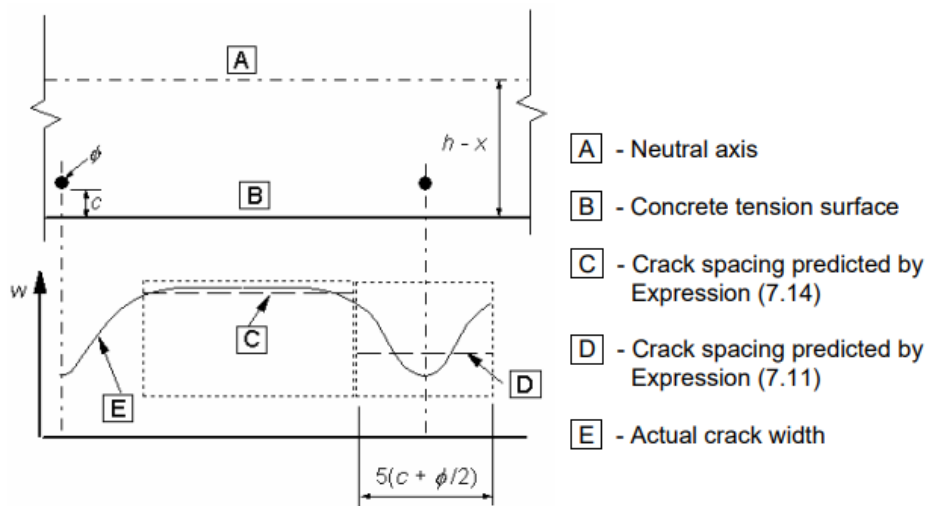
Crack width, w , at concrete surface relative to distance from bar
